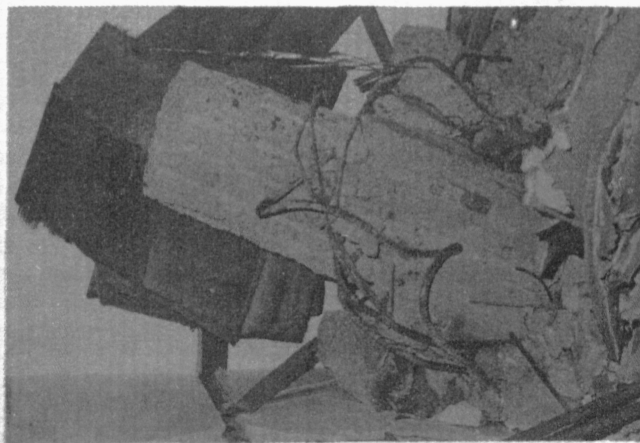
Detail of damage to the interior long-column at coordinates F-12 in Fig. 8. Note that top of the column punched through the second floor slab.
